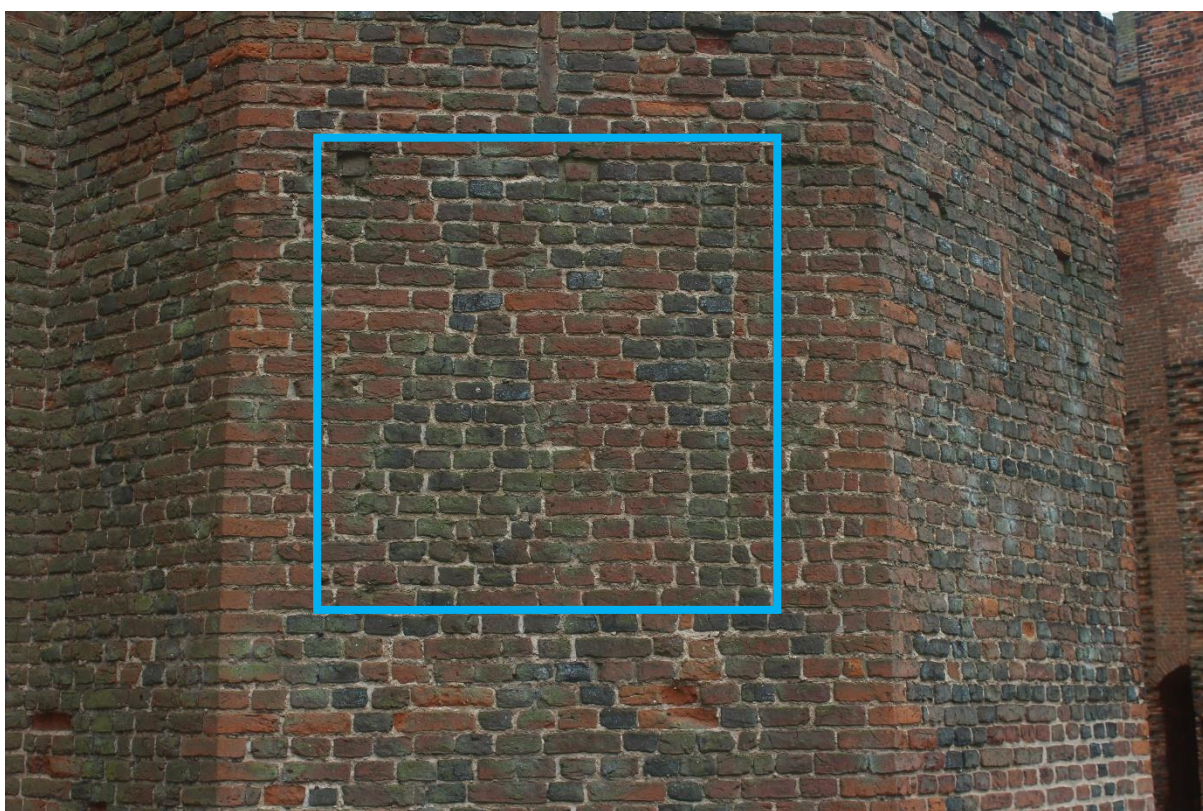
Detail of diaperwork armorial on the west elevation of the Great Tower
